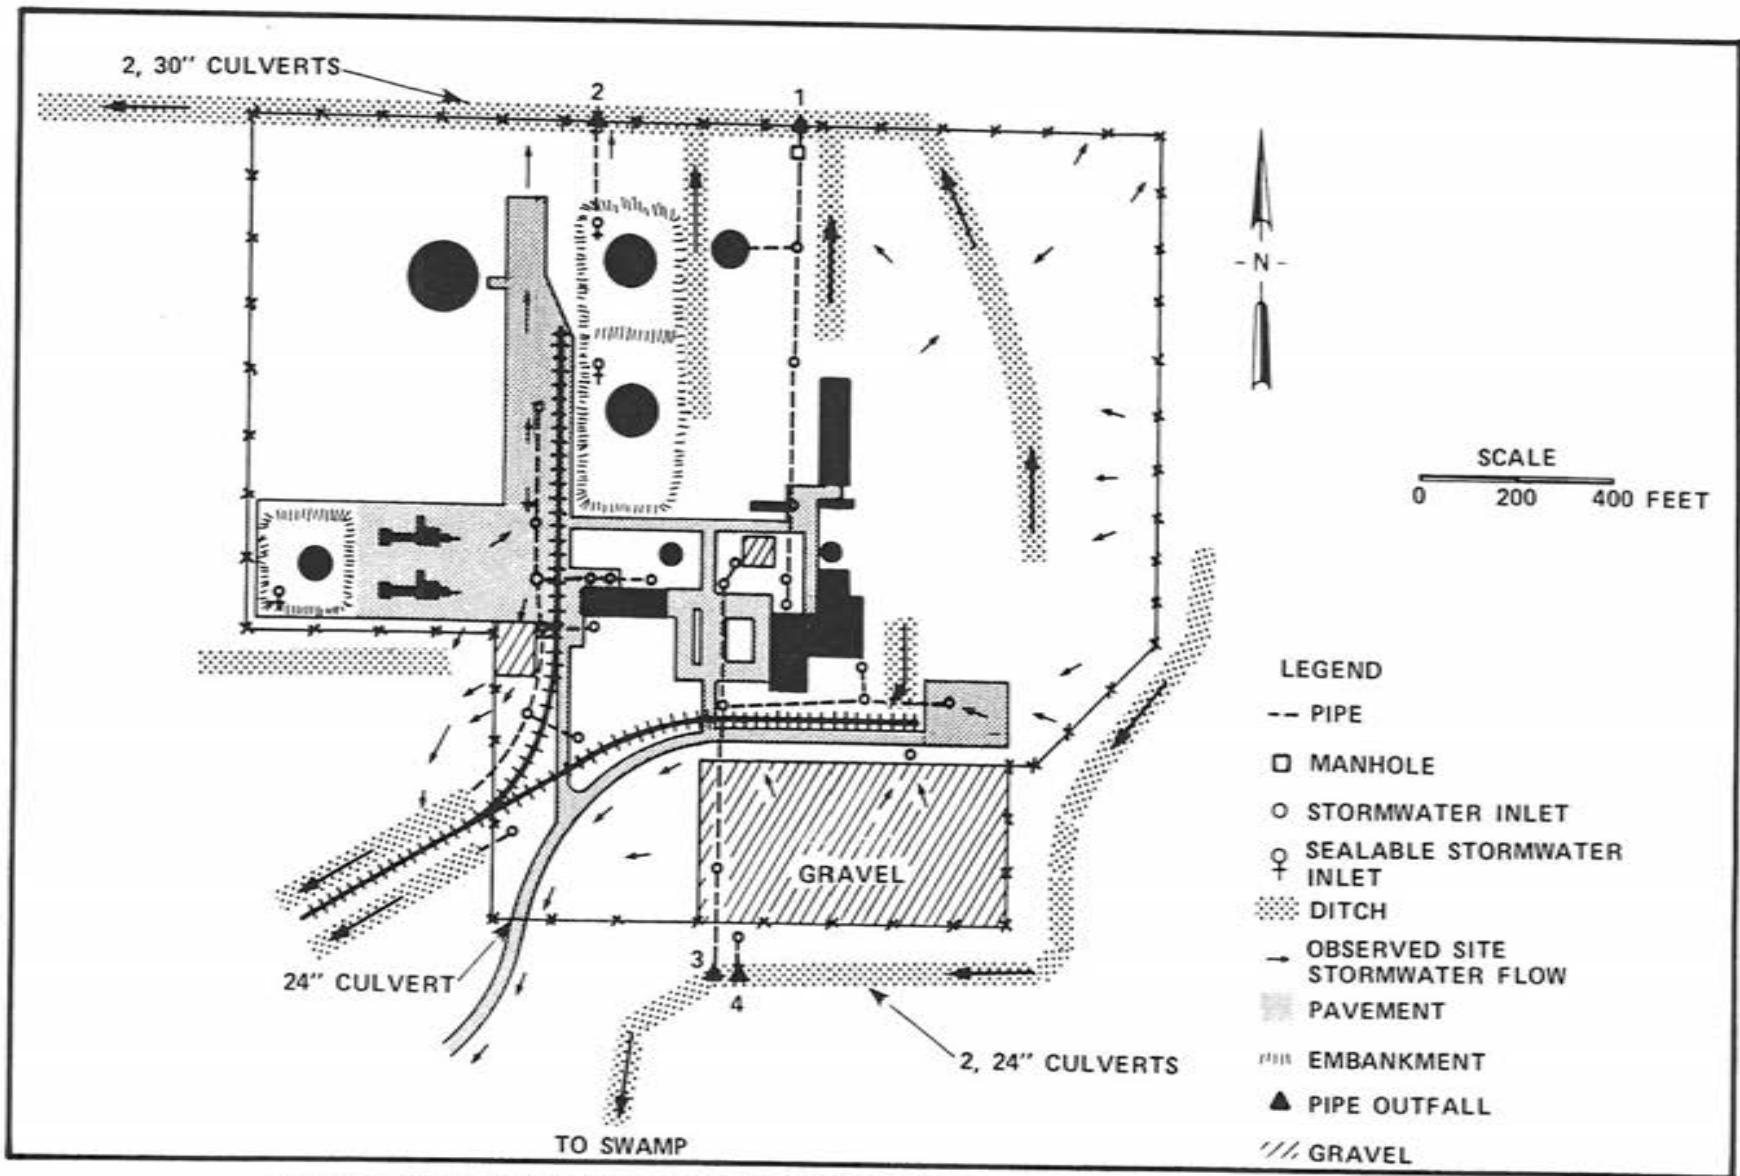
DRAINAGE OF THE EXISTING DEERHAVEN IMPROVED SITE AREA.
